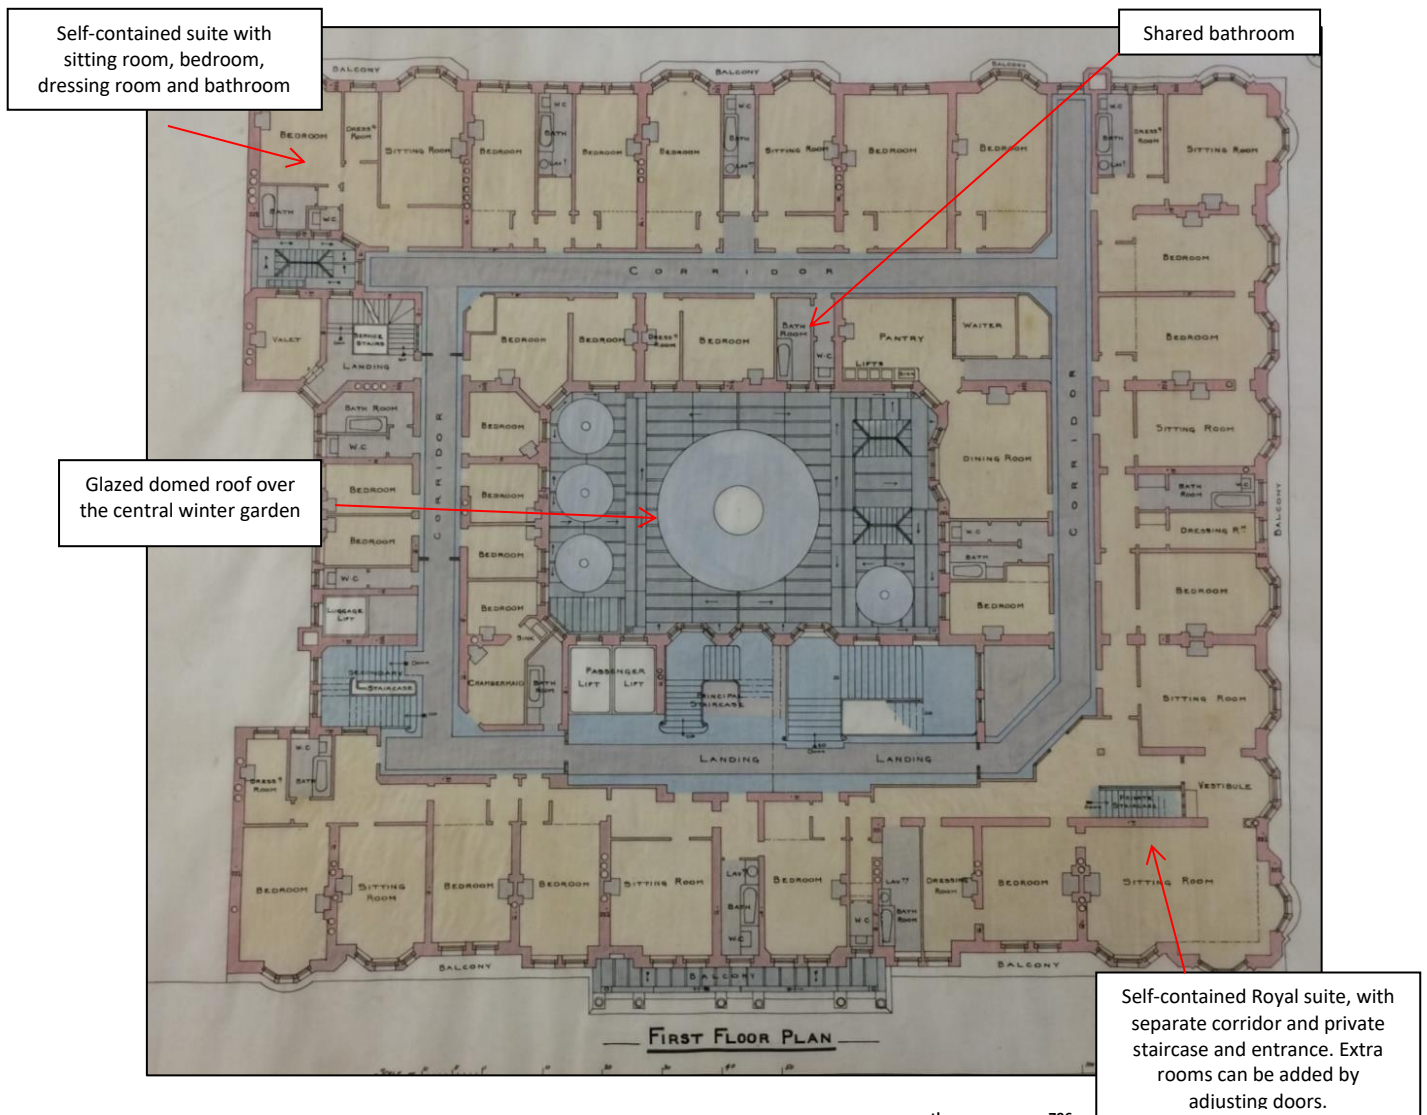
Plan for the First Floor at Claridge's, dated 10th July 1895 ⁷⁹⁶
